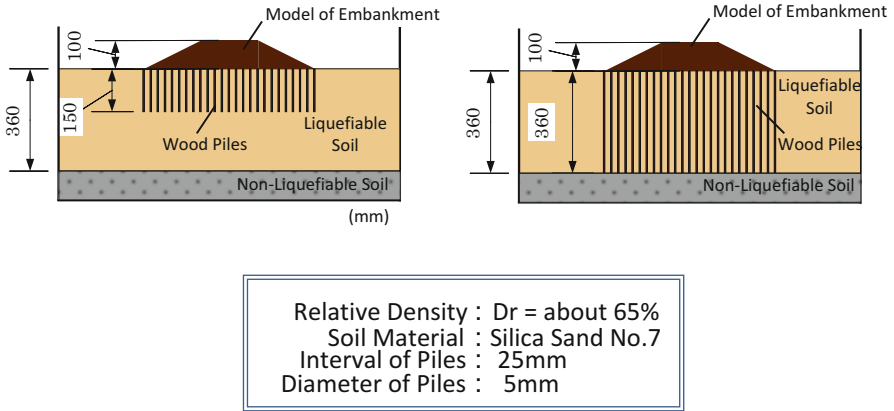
Shaking table test of wood piles to prevent sliding and subsidence of embankment due to soil liquefaction (under 1-g condition)
